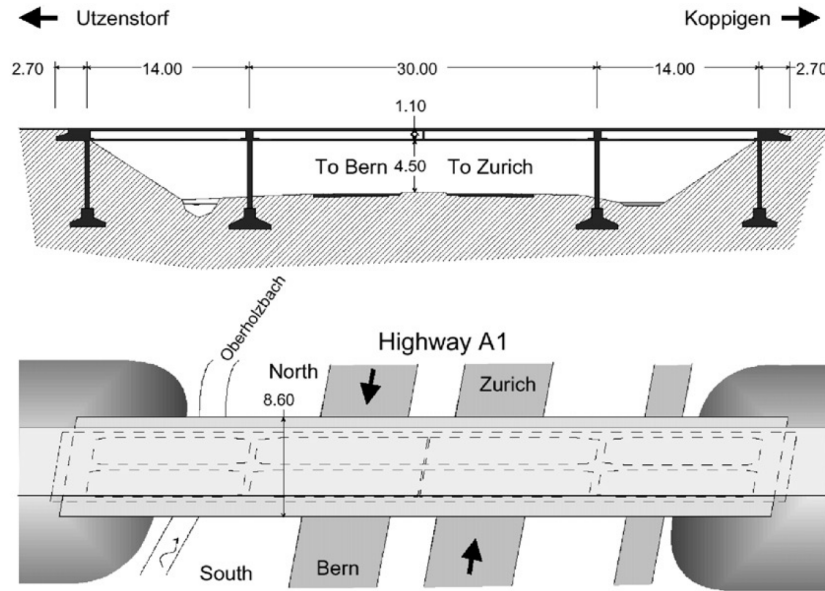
Longitudinal section and top view of the Z24-Bridge (Krämer et al., 1999).
